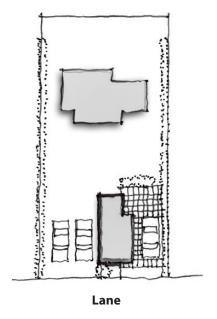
Dedicated coach house parking seperate from parking for principal dwelling
